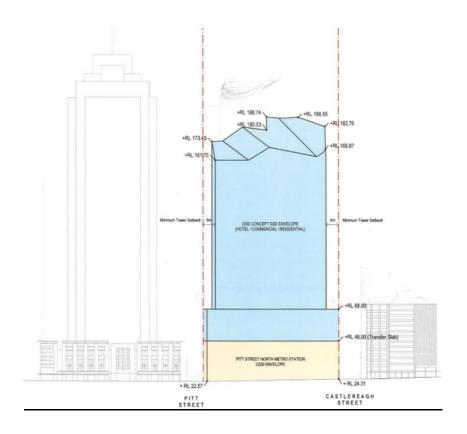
Pitt Street North Concept SSD DA – Envelope – East Elevation
